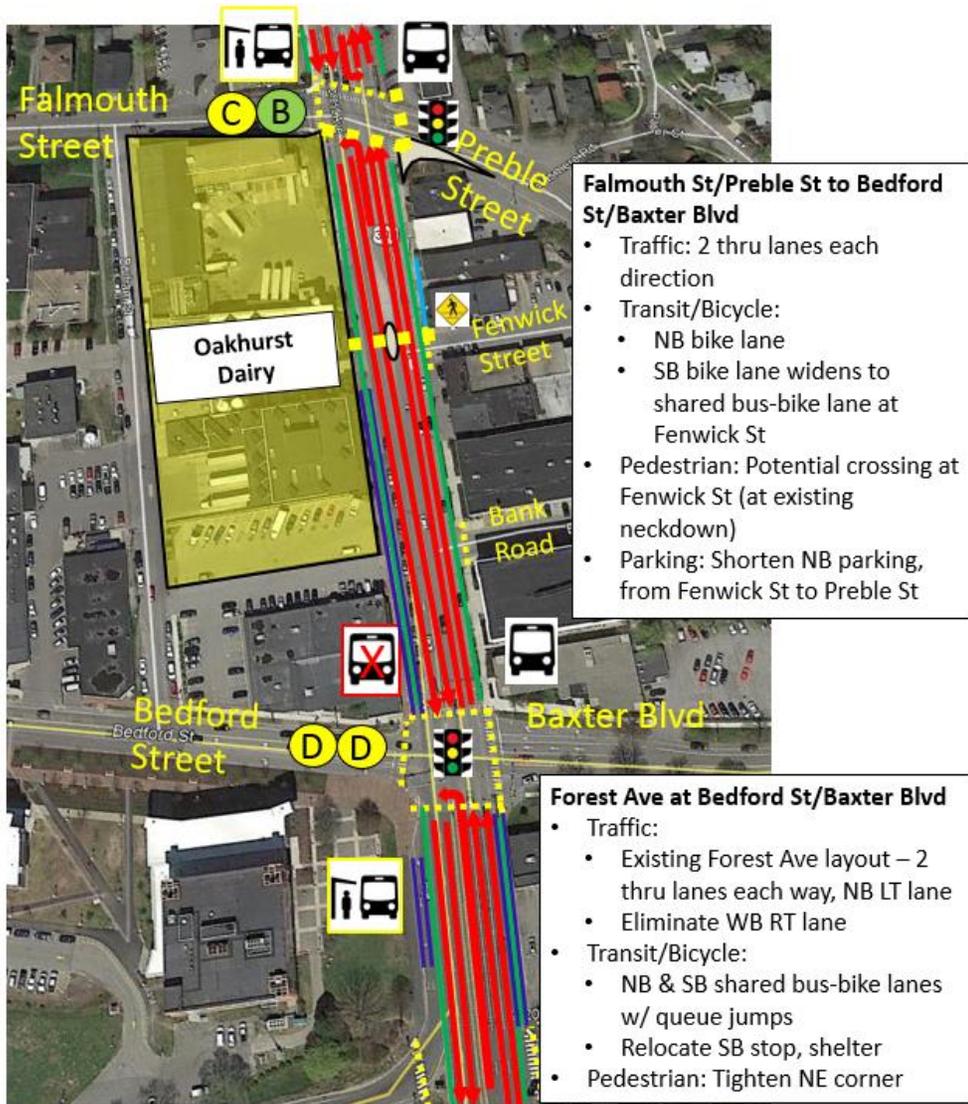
Falmouth Street/Preble Street to Bedford Street/Baxter Boulevard – Alternative 1
